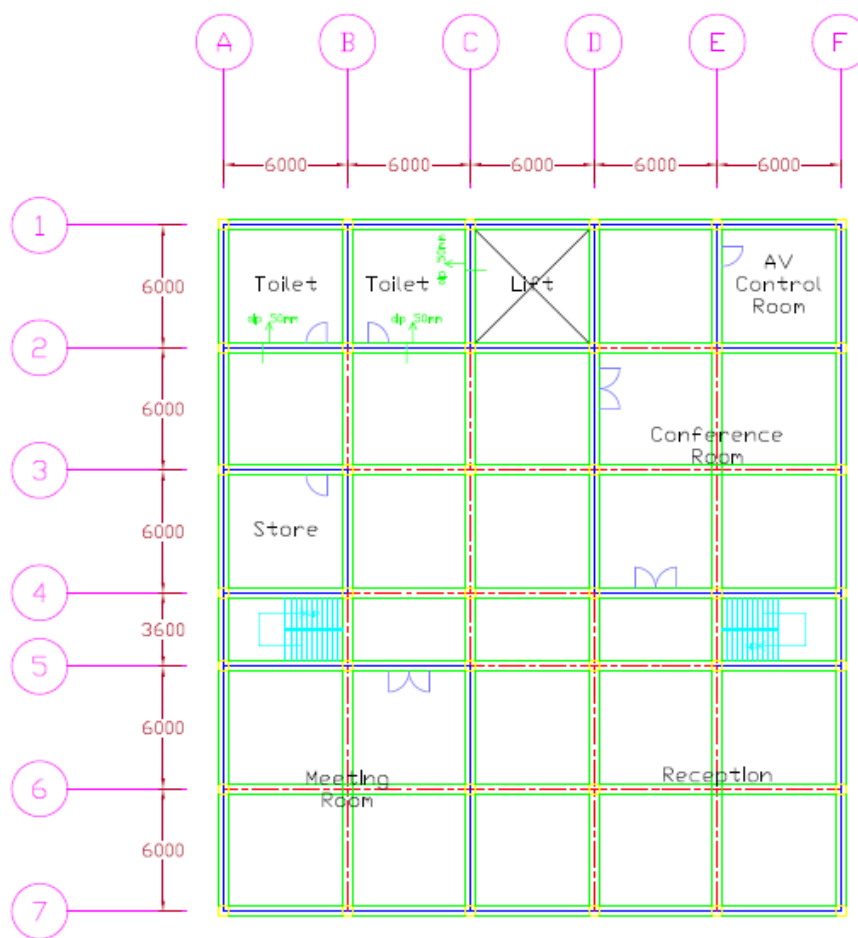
Layout plan in AutoCAD (Ground Floor)
